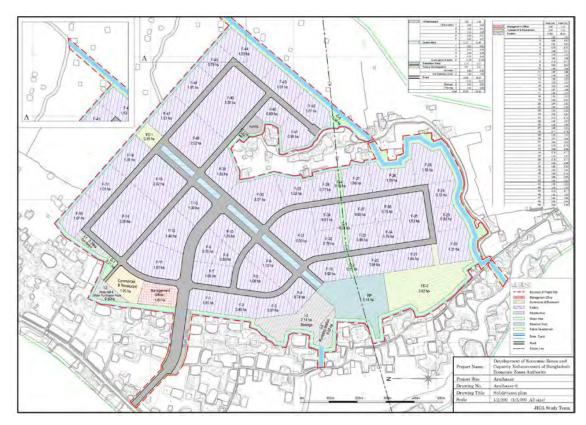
Land Use Plan for First Phase of Araihazar EZ Development
